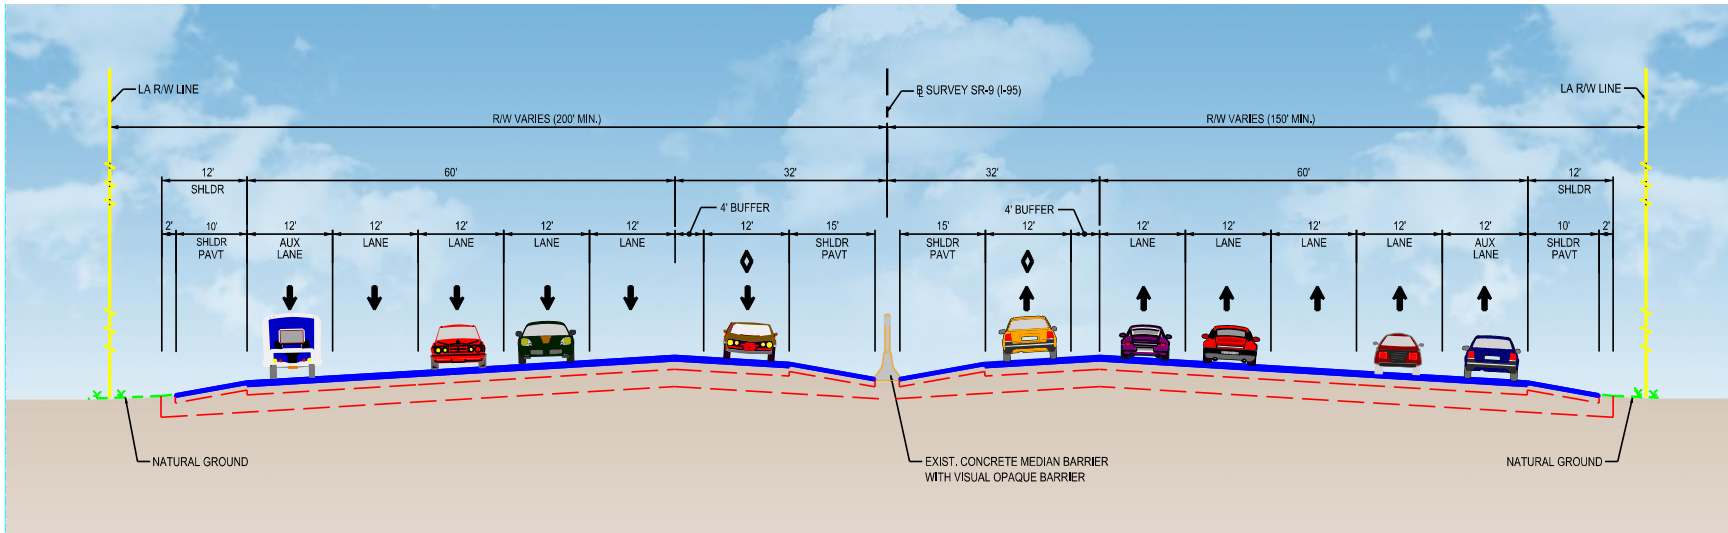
Typical Section – SR 9/I-95 South of Lantana Road
